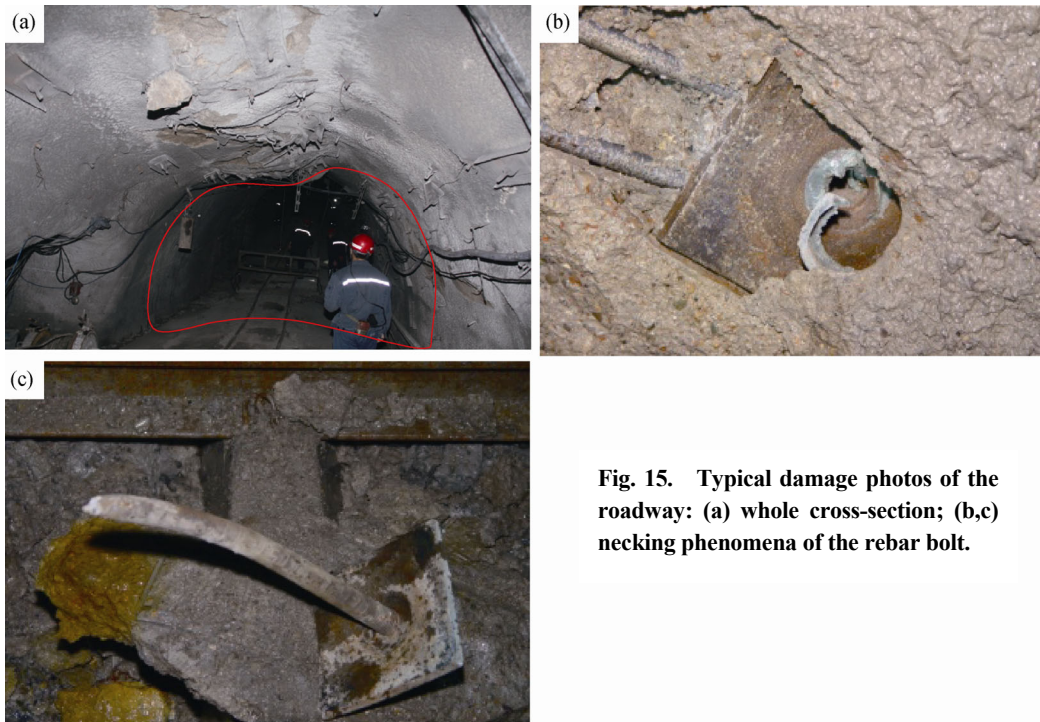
Typical damage photos of the roadway: (a) whole cross-section; (b,c) necking phenomena of the rebar bolt.
